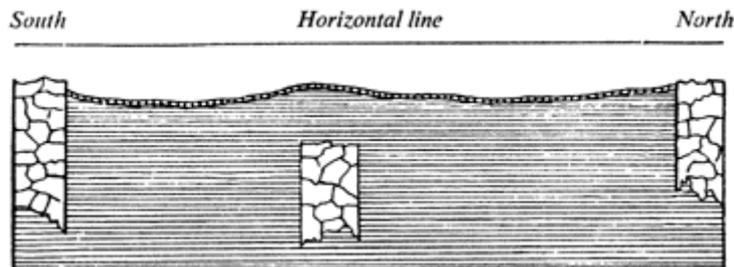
Section of the subsided floor, paved with tesserae, and of the broken-down bounding walls of a room at Silchester, which had been formerly enlarged, with the foundations of the old wall left buried. Scale 1/40.
